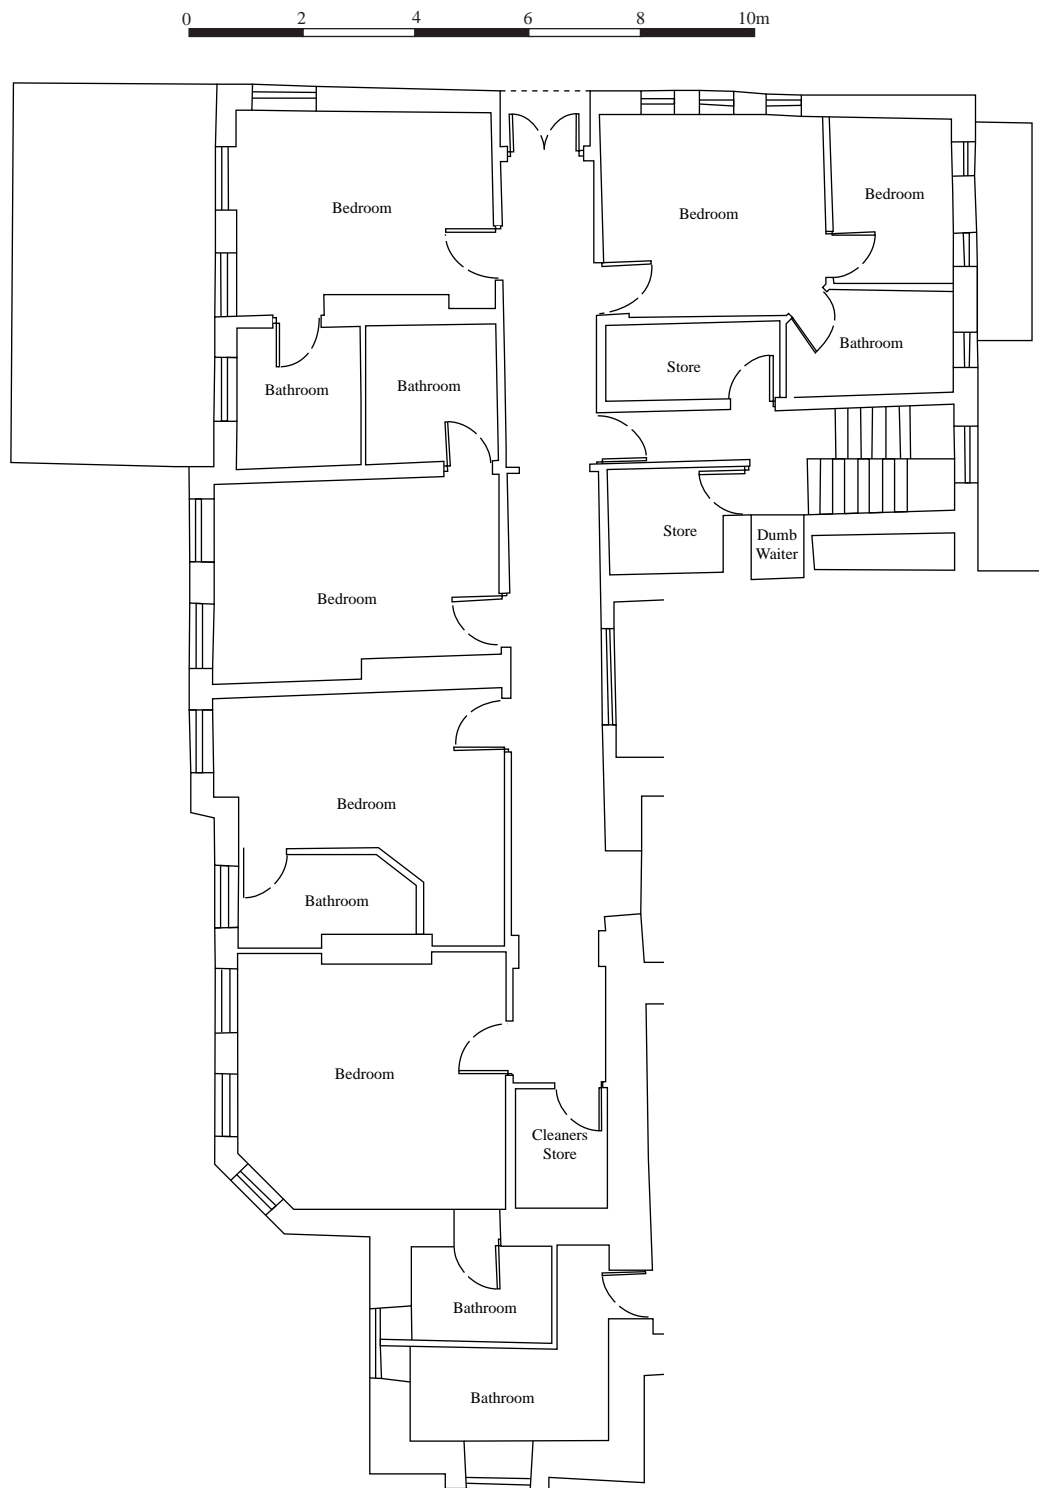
First Floor Plan of 1919 Extension, Deganwy Castle Hotel
